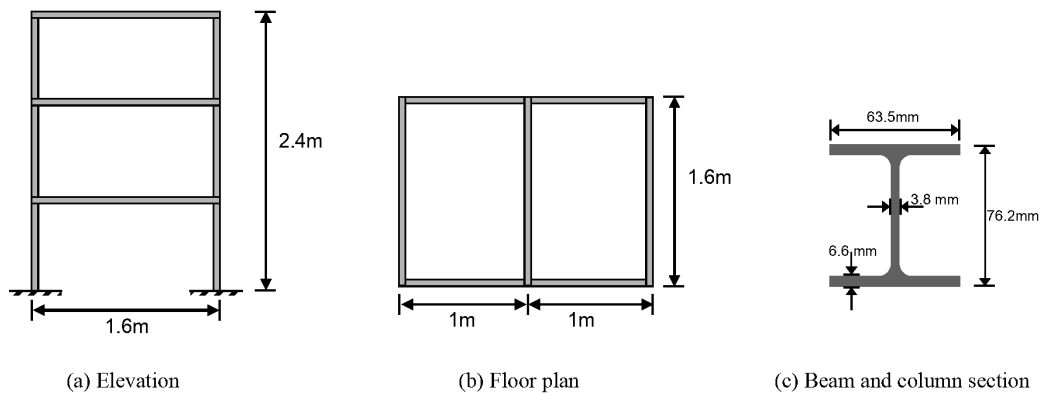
Schematics of the model structure: (a) Elevation; (b) Floor plan; and (c) Beam and column section.
